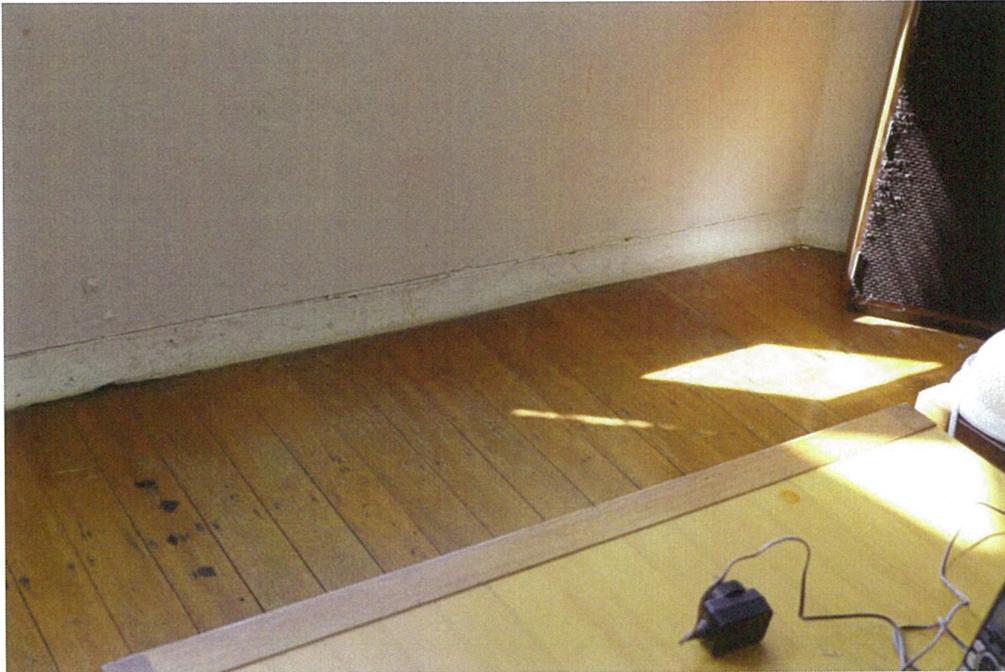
Non- structural cracks emerging between plastered wall and skirting board, lounge.
